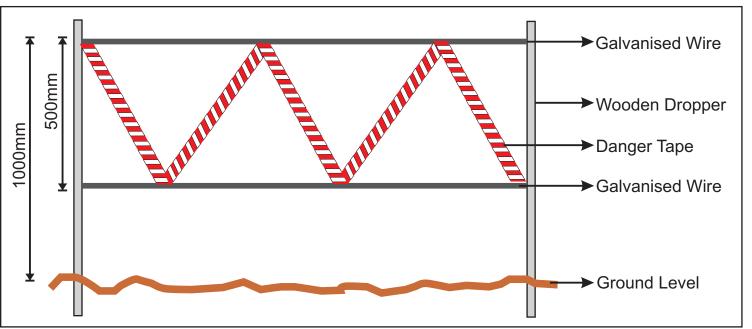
Plate A: Showing a cross section of a typical method of demarcation of no-go areas.
